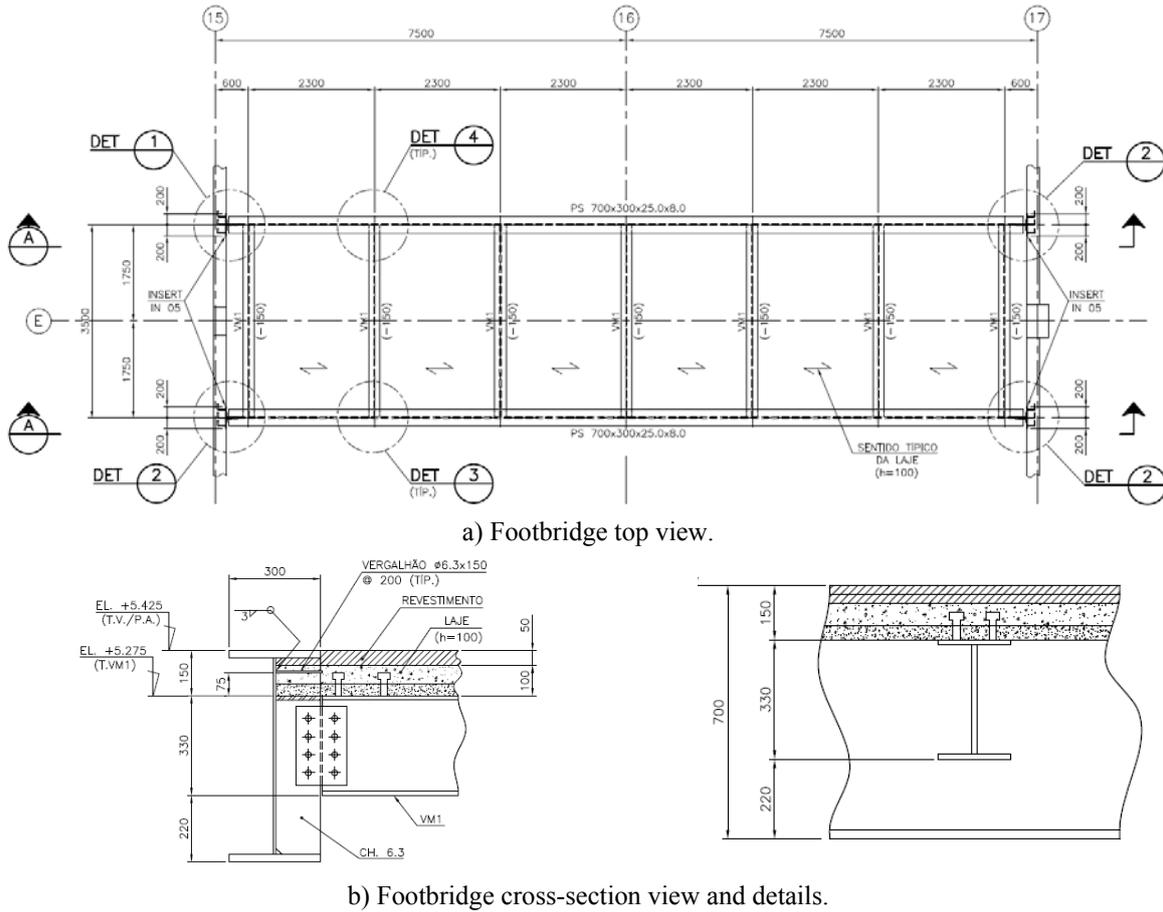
Investigated structural model: steel-concrete composite footbridge.
